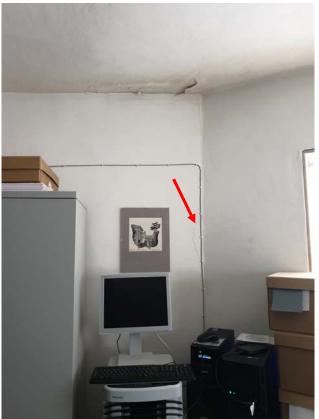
Filled mortices to the soffit of the beam over 'R6'
